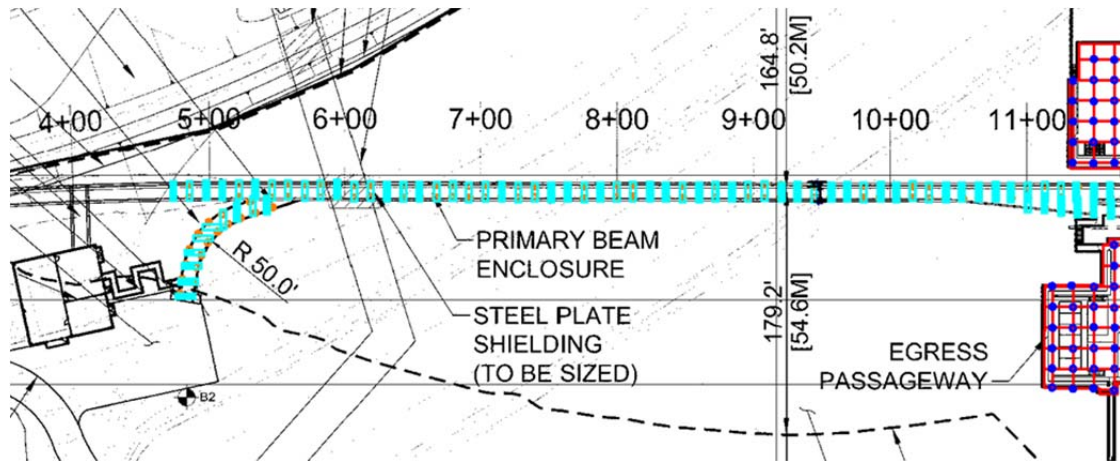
Drilled shaft pier cap locations for the Primary Beam Enclosure.
